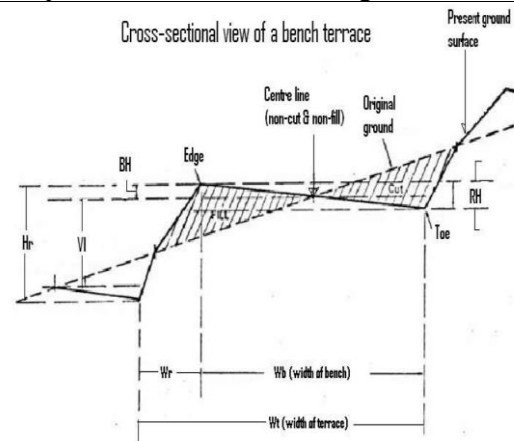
Engineering design of a bench terrace showing key dimensions
